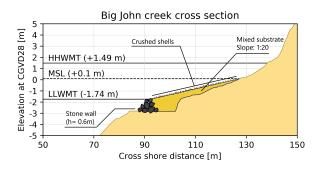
Design of clam garden at the Big John Creek cross section. A small has been built around X = 90m. Behind the wall, sediments have been placed which are enriched with shell hash at the top
